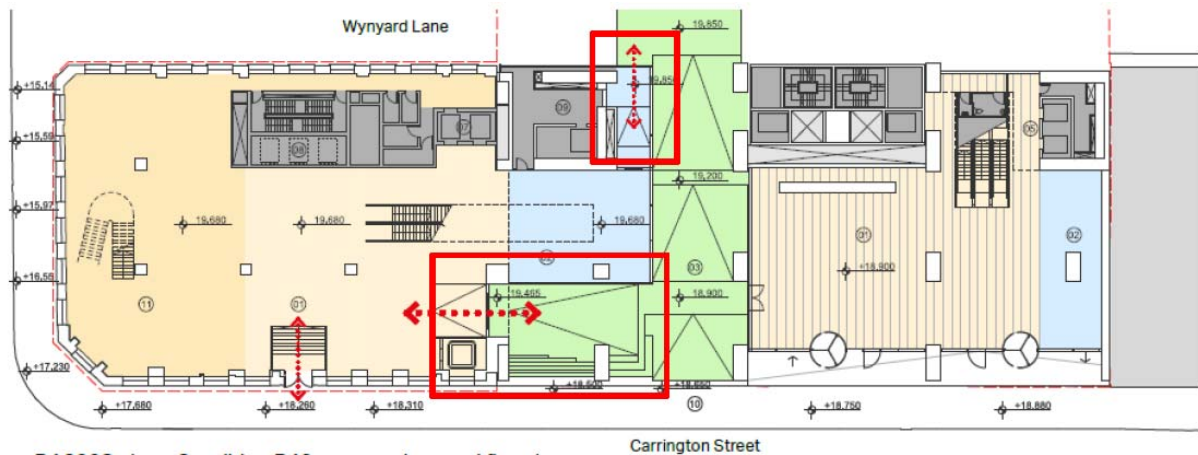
| Approved ground floor layout (location of proposed changes in red) (Source: Applicant's Modification Report)
